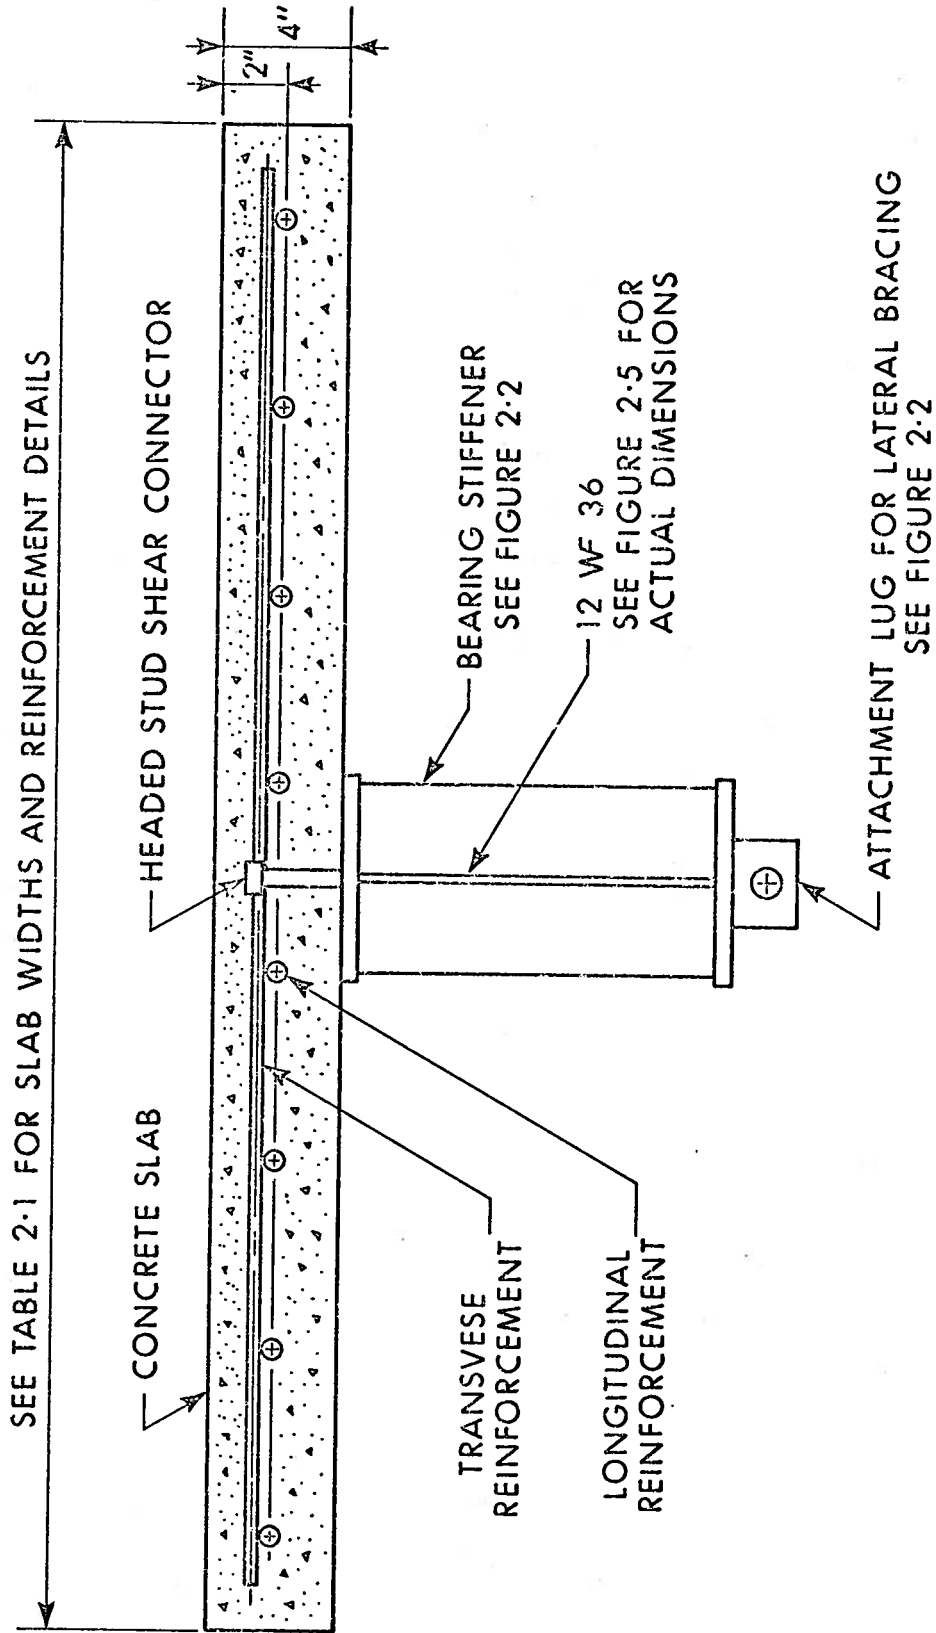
COMPOSITE BEAM CROSS SECTION
